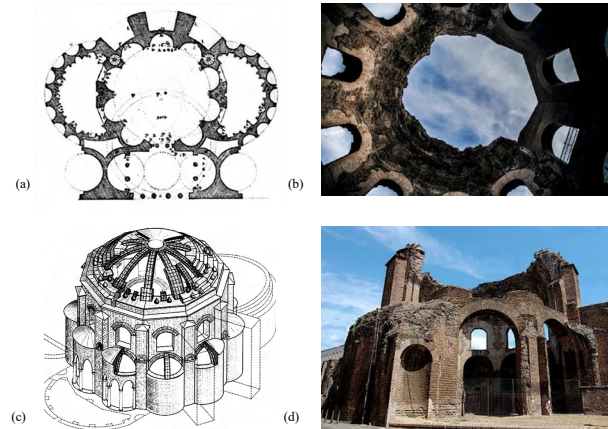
Minerva Temple: (a) Plan, (b) dome; (c) 3D reconstruction, (d) Side view
